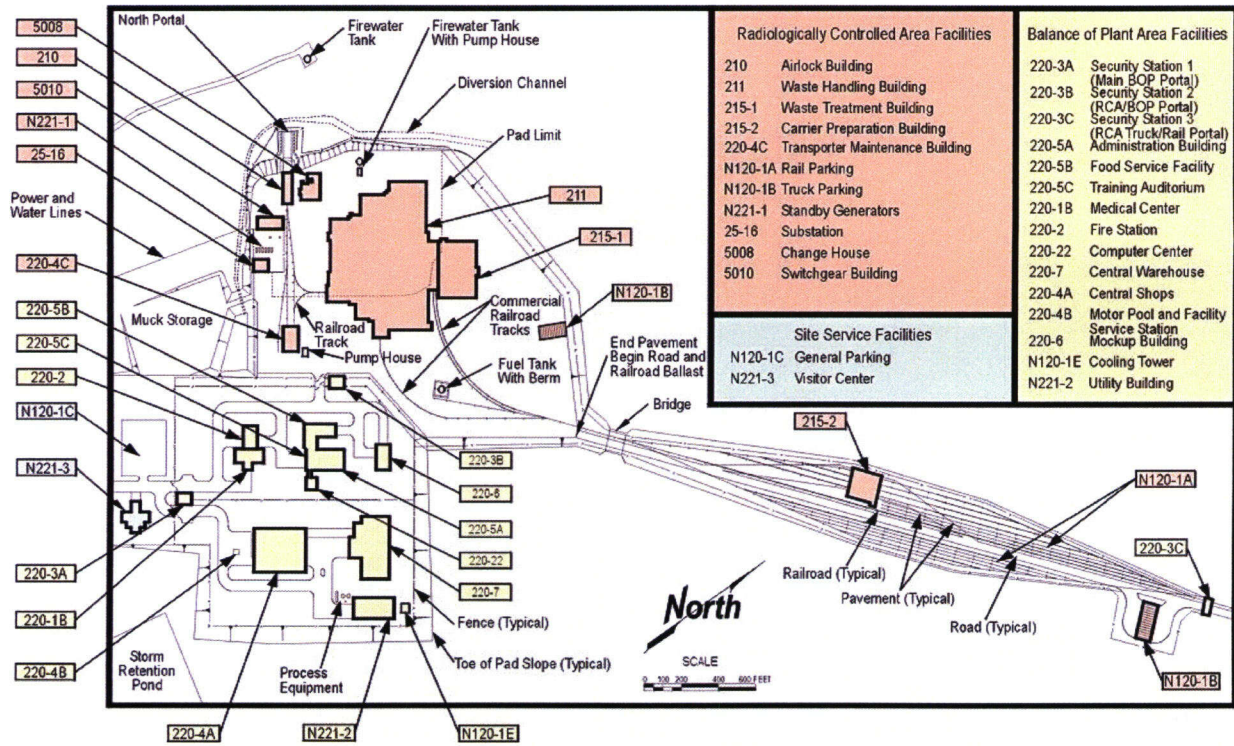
Layout of North Portal Surface Facilities (DOE, 2001b)
